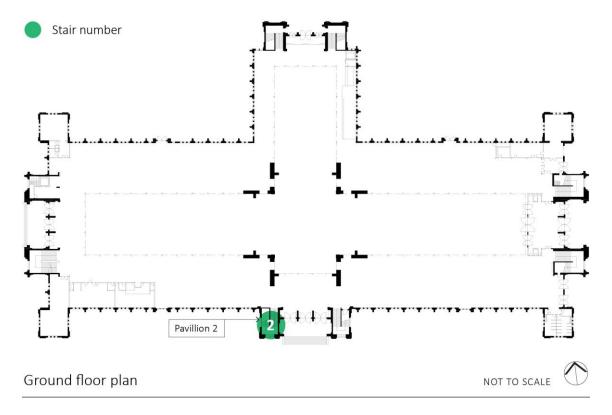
Ground Floor Level Plan indicating the location of the works effected area.
